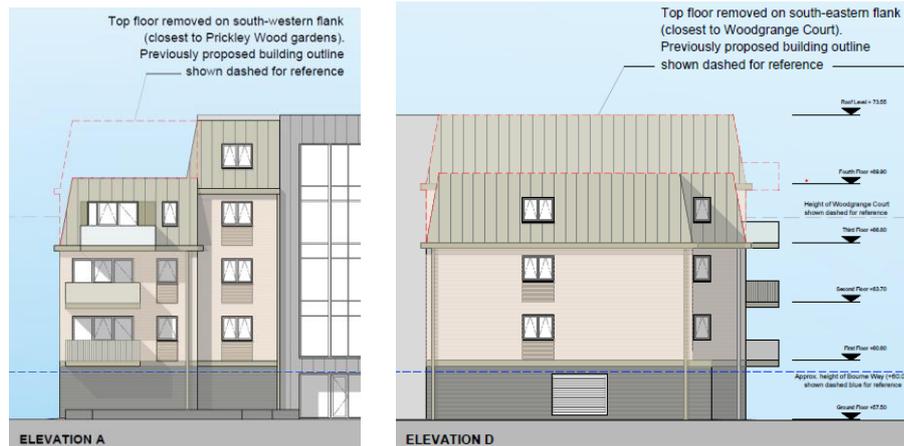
Proposed elevation A and D facing rear of Woodgrange Court
